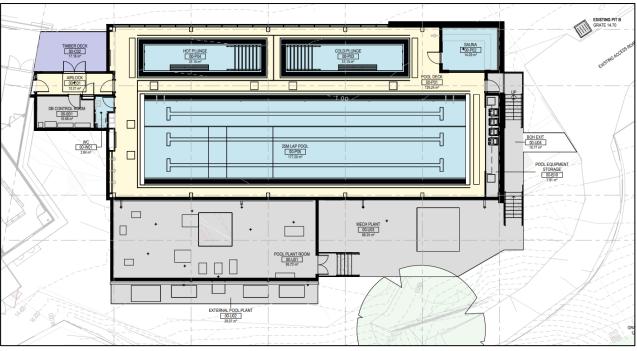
Pool facility layout plan (Source: Area/Floor Space Plan, prepared by Populous, 15 December 2023)
